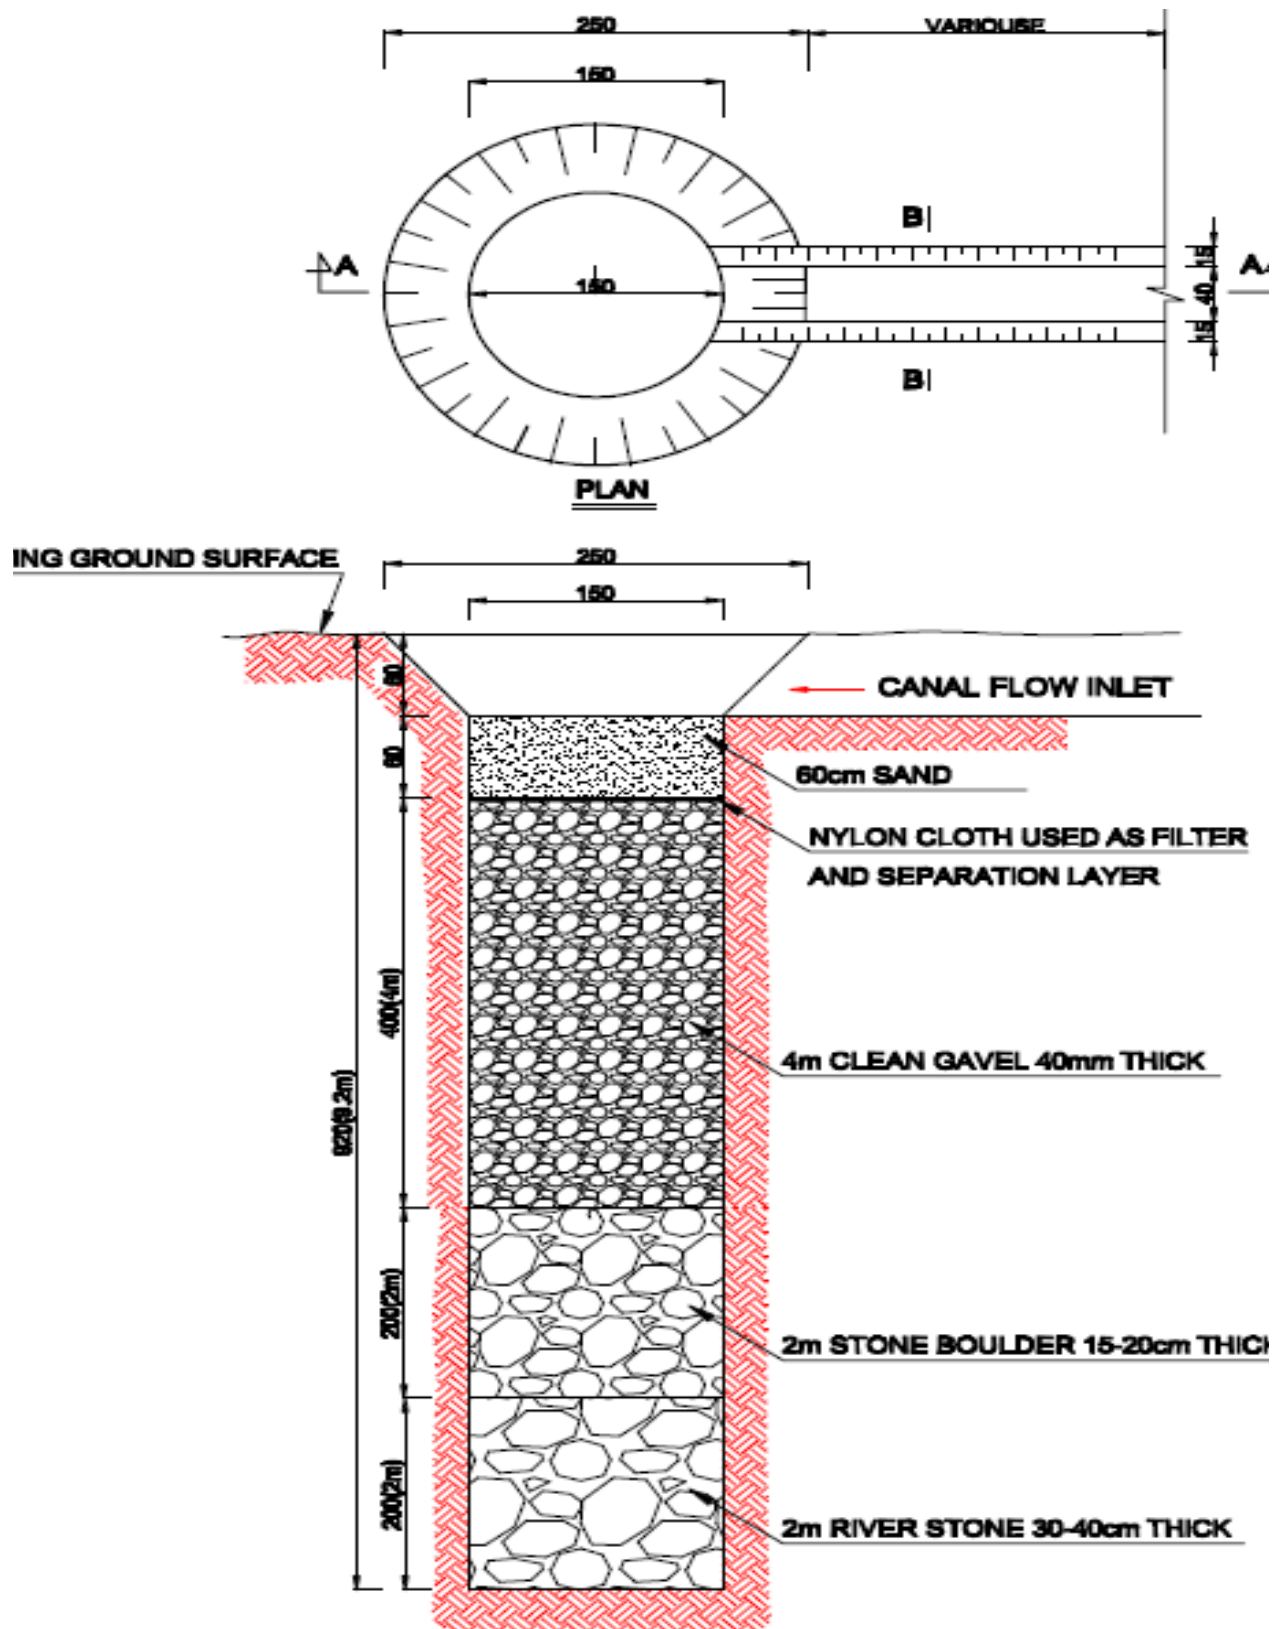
Plan and section of soak pit for artificial recharge. DACAAR 2014
